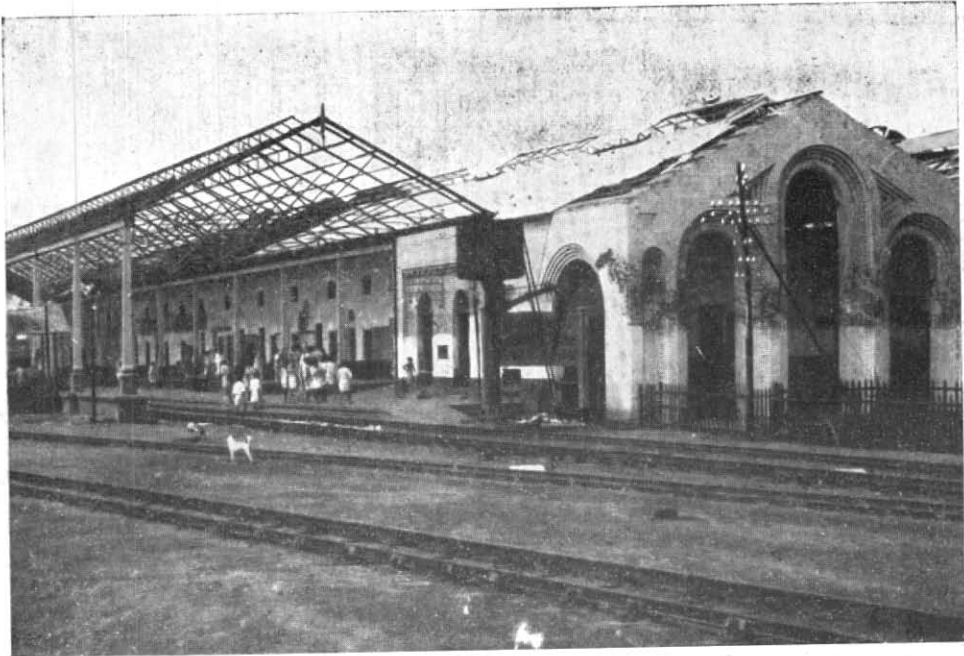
Entire roof of the railway platform of Nagapattinam Station was blown off
